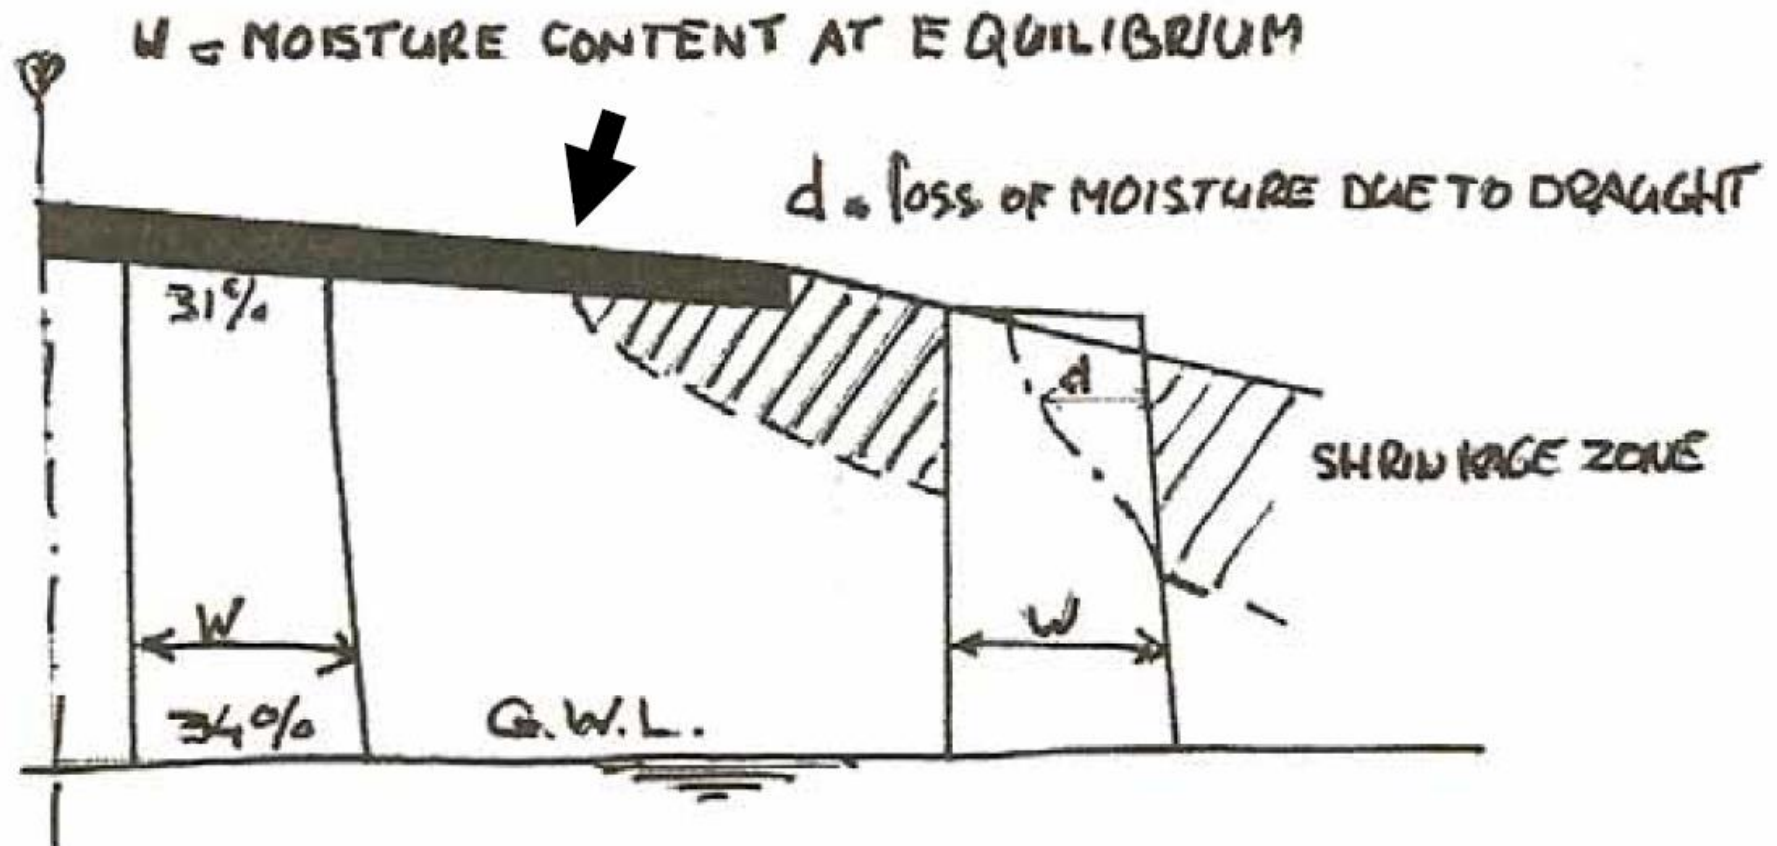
Due to an extended dry period, the subgrade under the pavement edge started to shrink resulting in significant cracking at location of the arrow.
